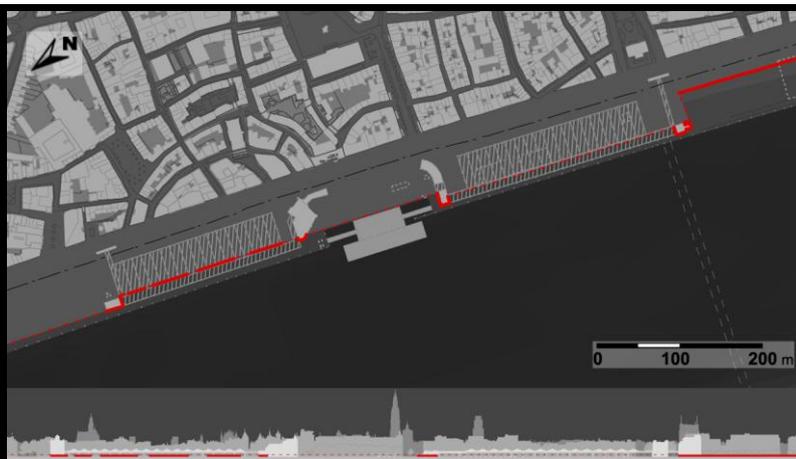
Plan and elevation of the new flood-protection solution on the central quay segment
